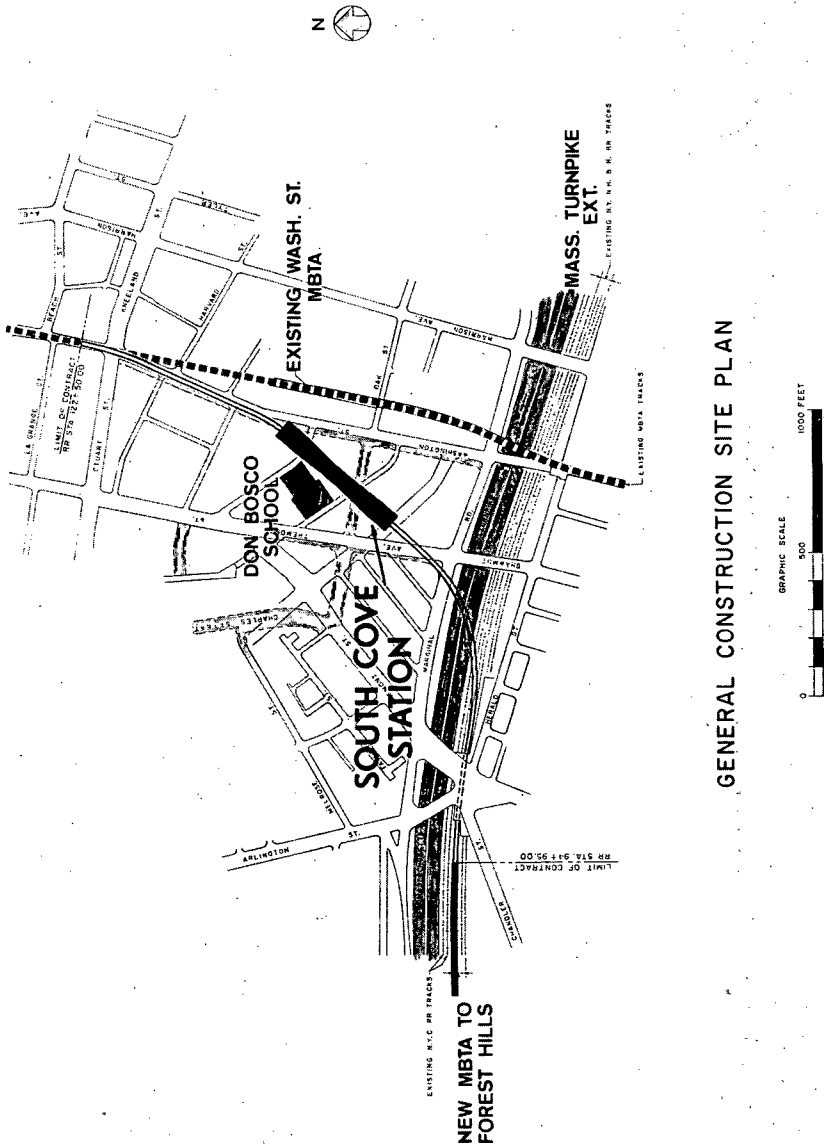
Construction site plan shows the half-mile long tunnel as it passes within inches of the proposed addition to the Don Bosco Technical High School and then under the Massachusetts Turnpike Extension. The existing Arlington-Tremont Street bridge will be demolished to allow open-cut operations to be carried out on a 725-foot section. The bridge will be replaced after the open-cut section is installed. The new South Cove passenger station will have side platforms 410 feet long.
